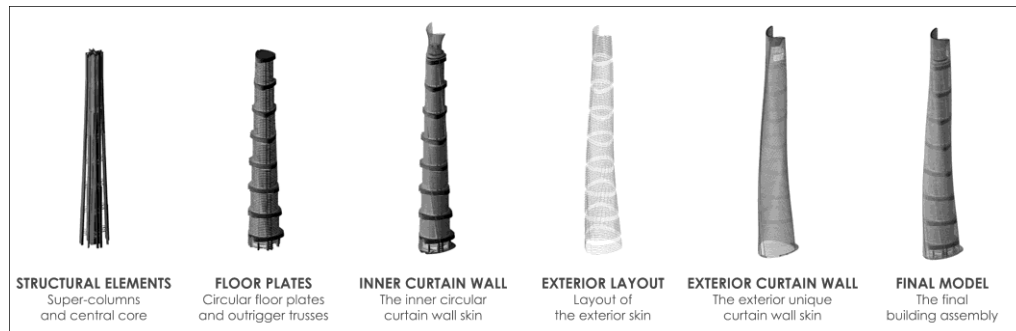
The 3-D Model of Shanghai Tower Encompassed Informative Models of the Unique Architectural and Structural Elements of the Building
